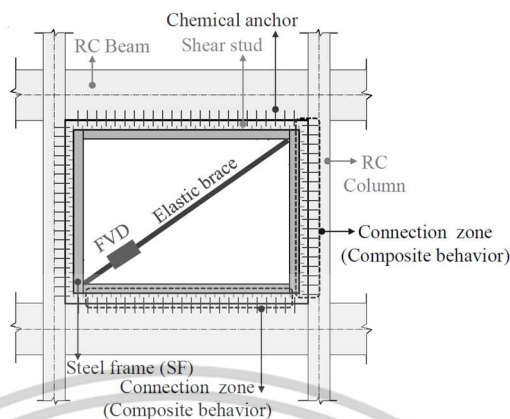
Retrofit of RC frame using friction brace dampers with steel frames.
